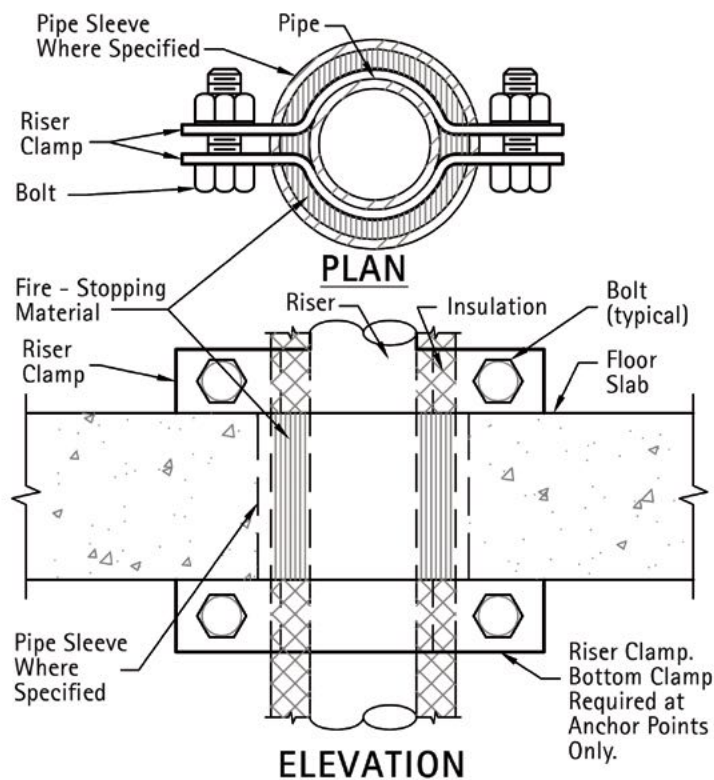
Arrangement for Anchoring Copper Tube Stack Passing Through Concrete Floor
